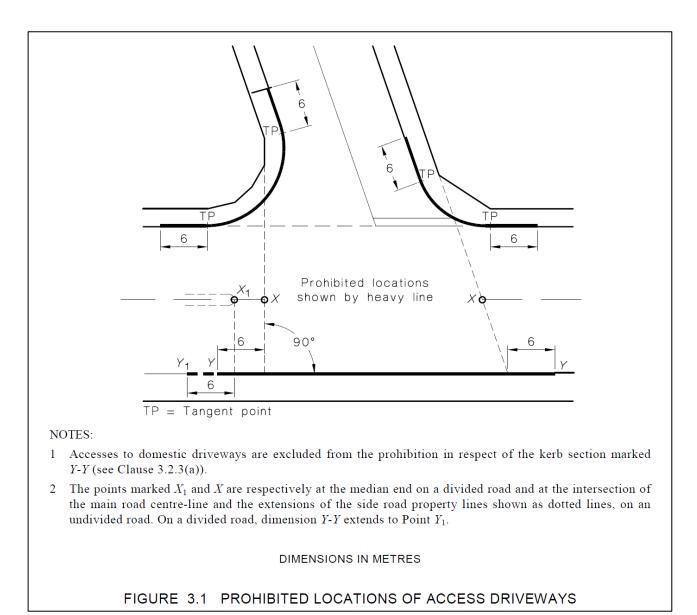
Prohibited location of driveways (AS/NZS 2890.1 Parking facilities - Off street parking)
